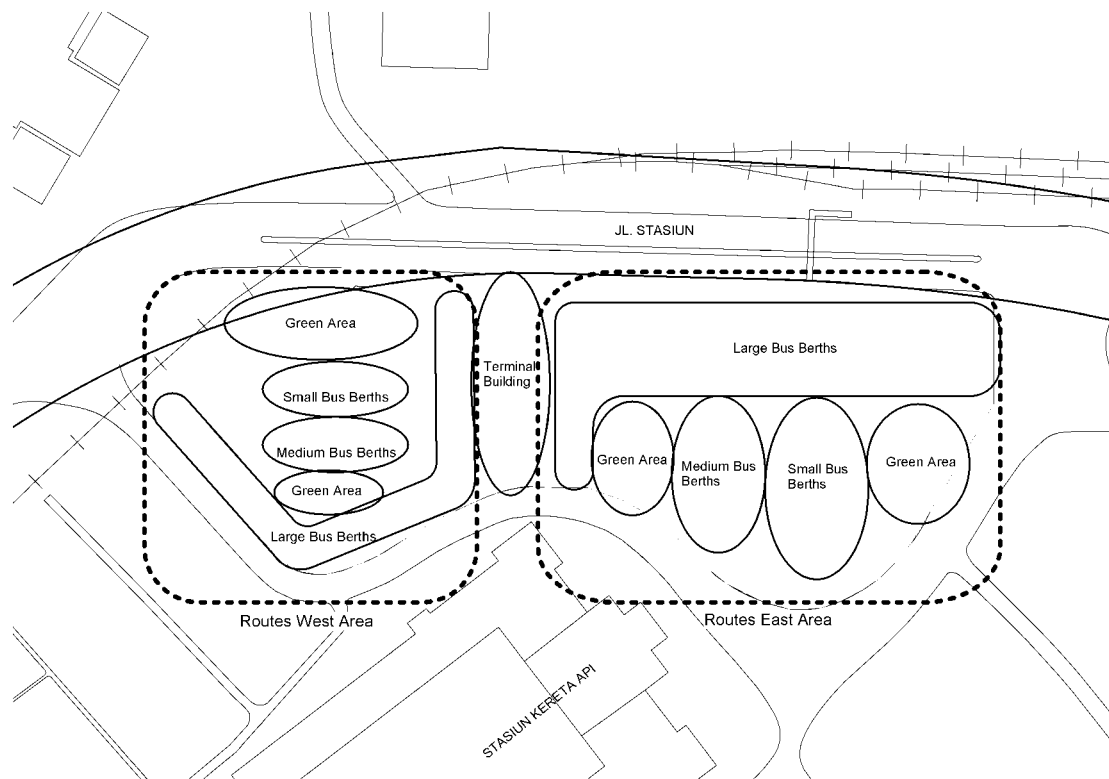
B-7 Proposed Spatial Structure for the Alternative-1
